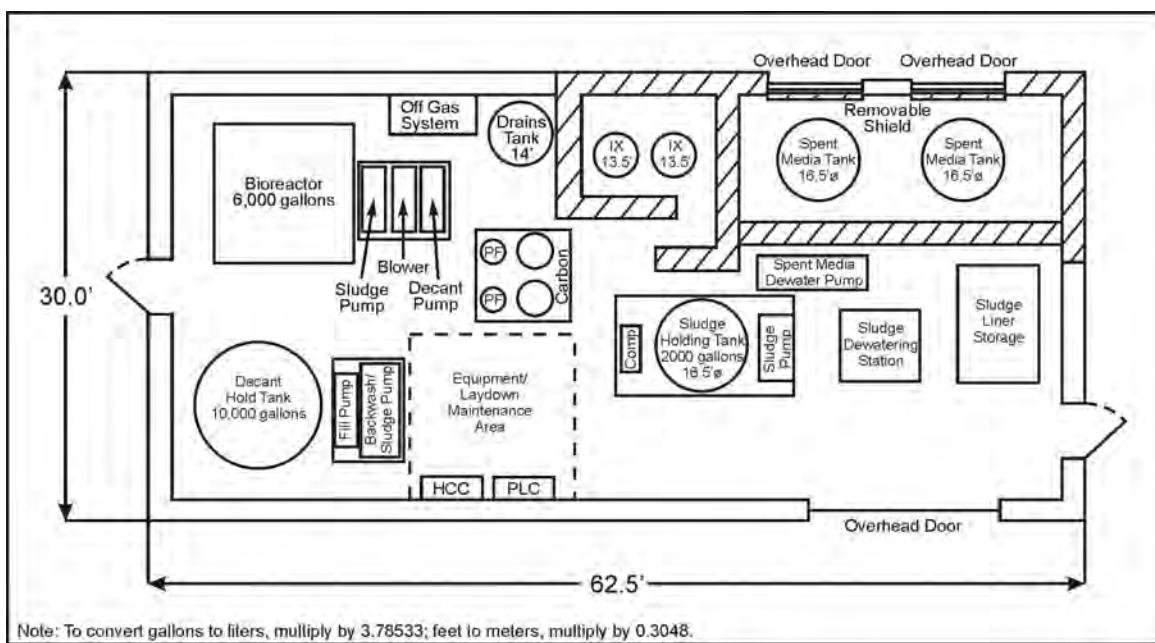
Conceptual Leachate Treatment Facility in Waste Management Area 9 – Plan View
